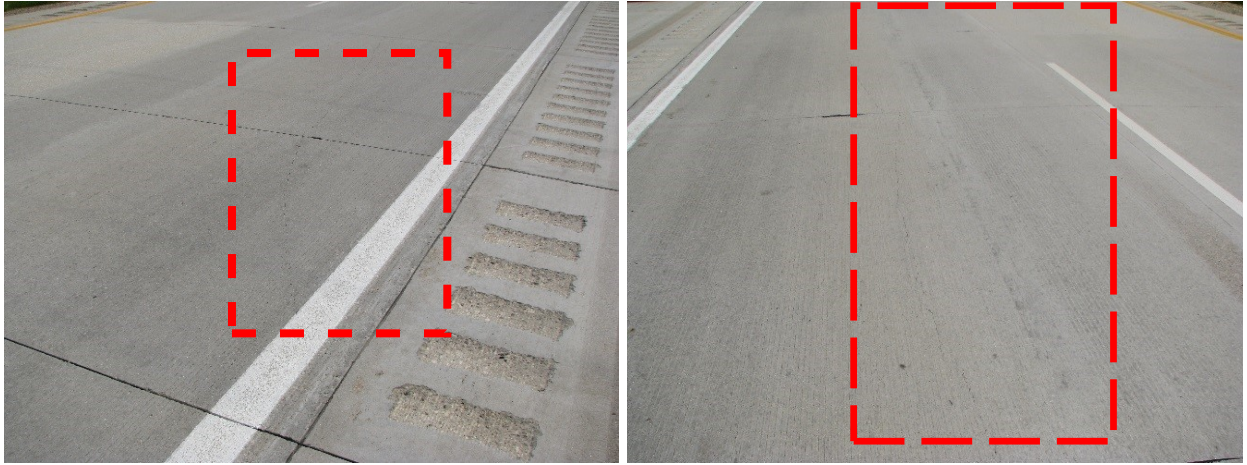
Longitudinal cracks on US-10 near Coleman, MI
